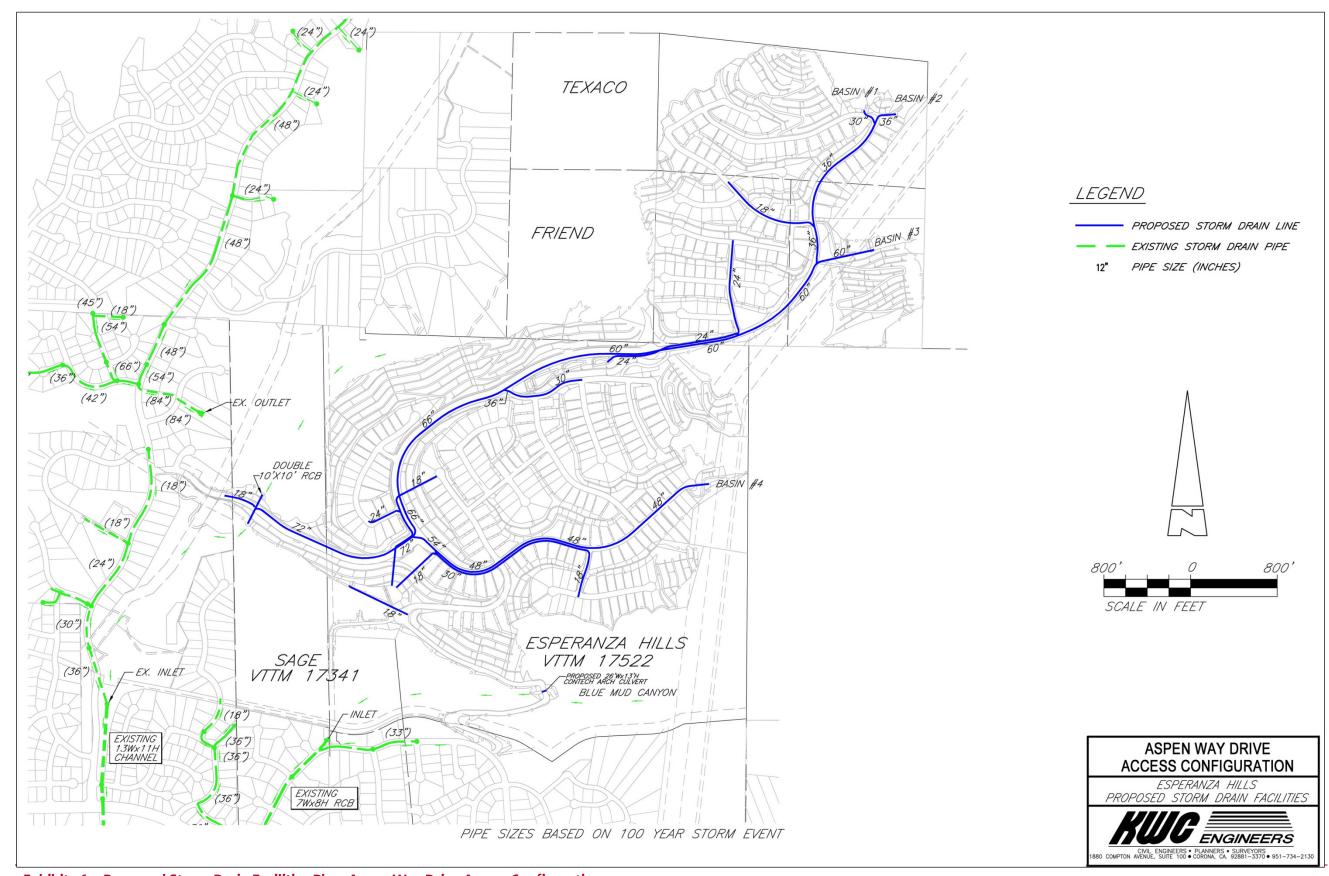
Proposed Storm Drain Facilities Plan, Aspen Way Drive Access Configuration
